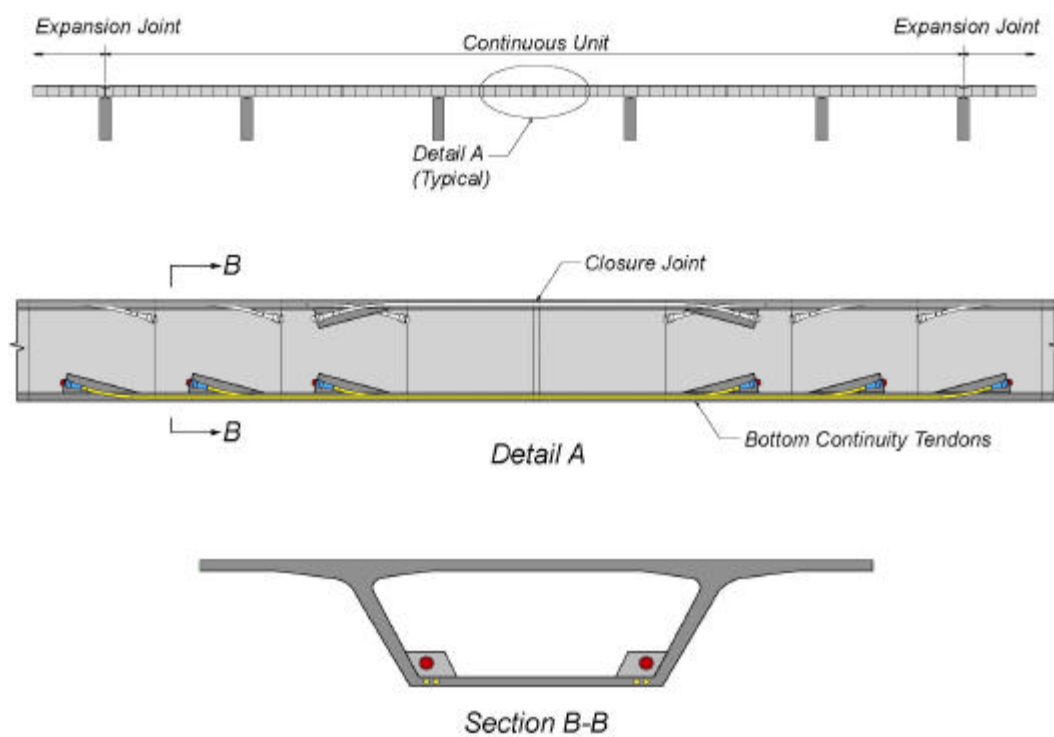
Bottom Continuity Tendons for Balanced Cantilever Construction
